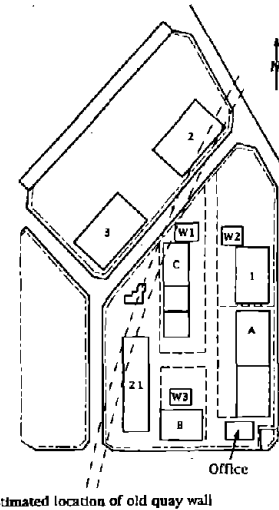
Site plan of the warehouse facility on Port Island where ground improvement was used.
